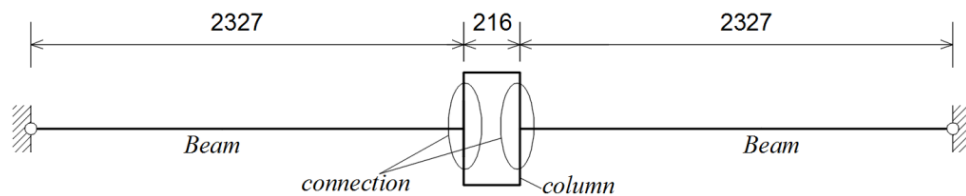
Overall geometric dimensions of the double-span beam assembly
